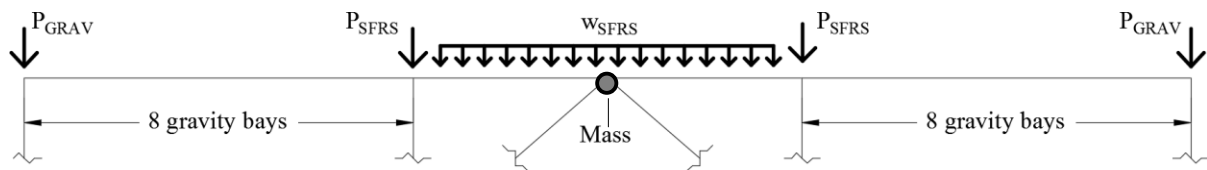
OpenSees* elevation with locations of gravity loads and mass. Roof shown.
